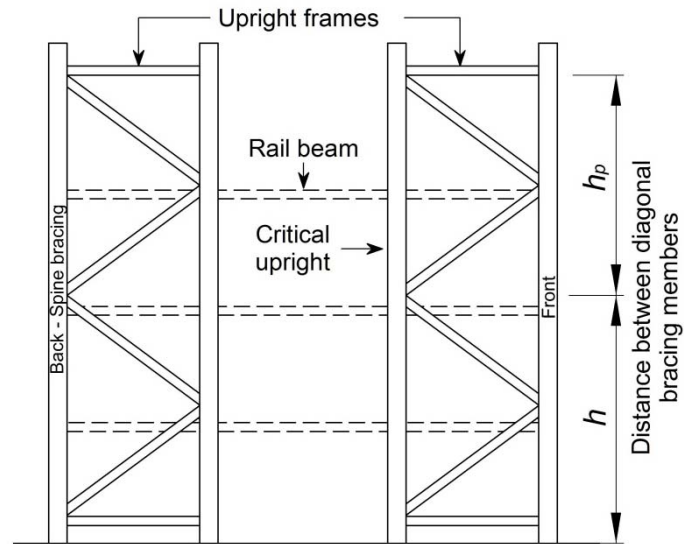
Frame bracing pitches h and h_p , unbraced segment
